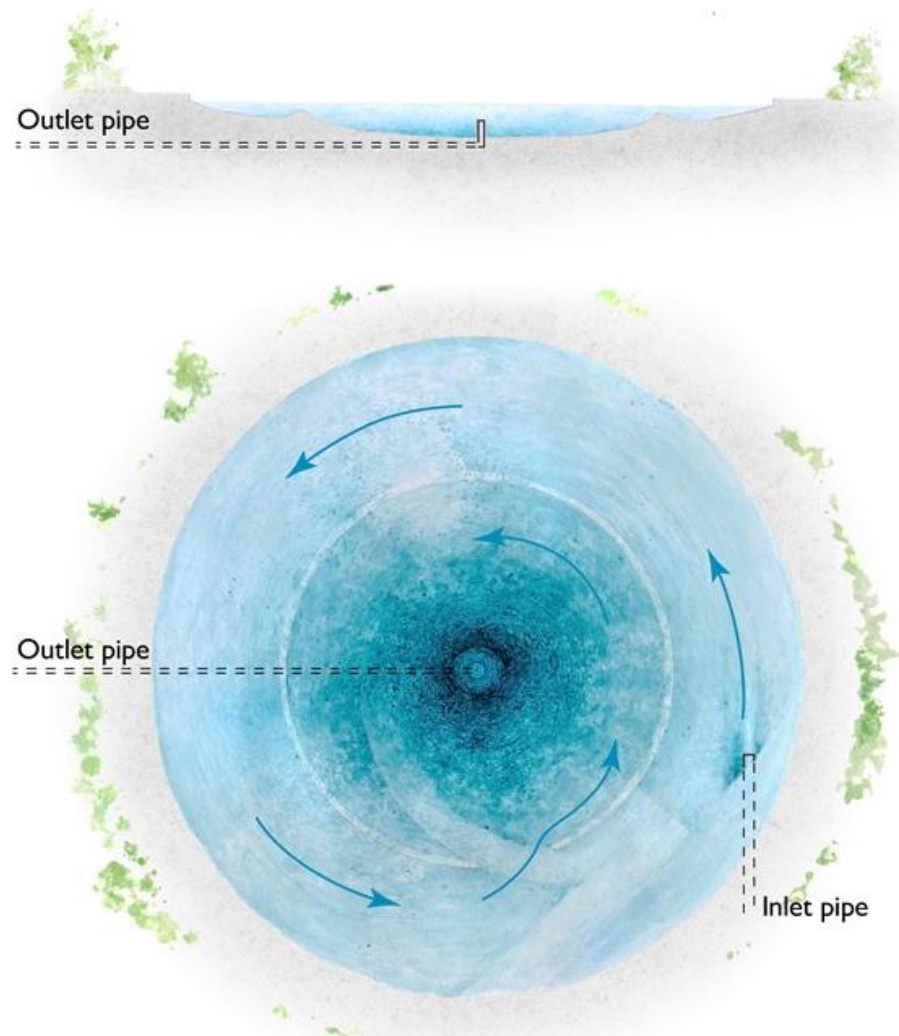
Cross-sectional profile and plan of a Nautilus Pond™
